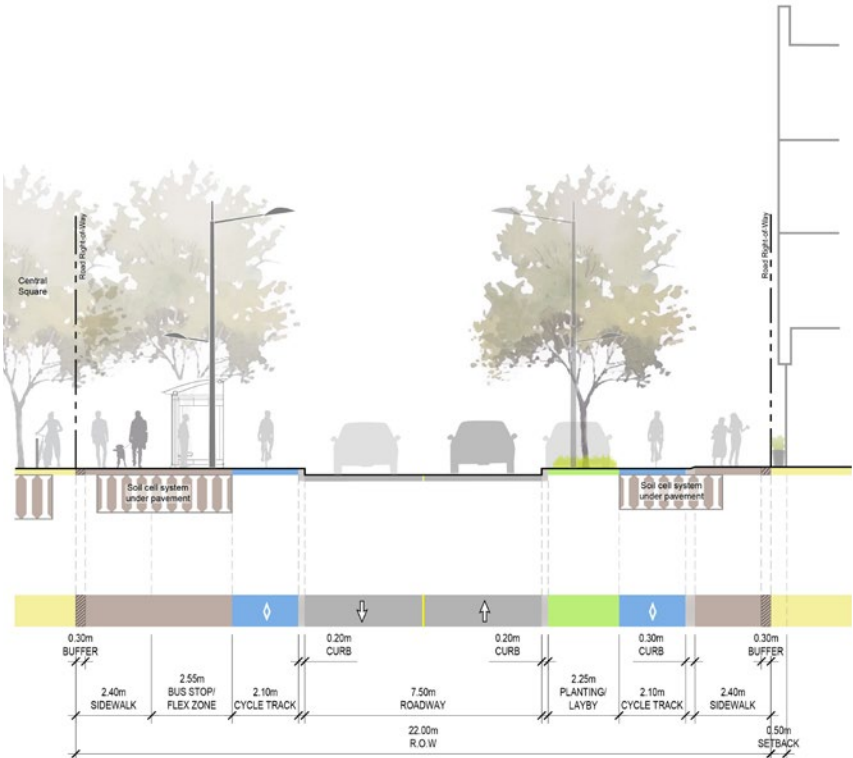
Conceptual cross section of Street D next to Central Square POPS
